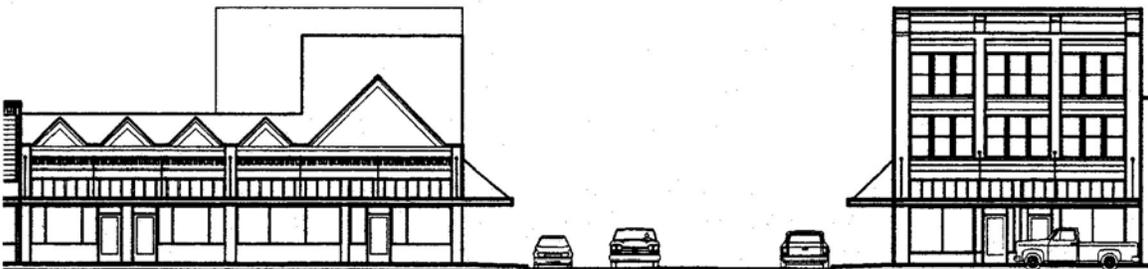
The massing of the corner portion of the building is increased in height so as to allow it to "hold the corner" and to provide a better complement to the taller building across
